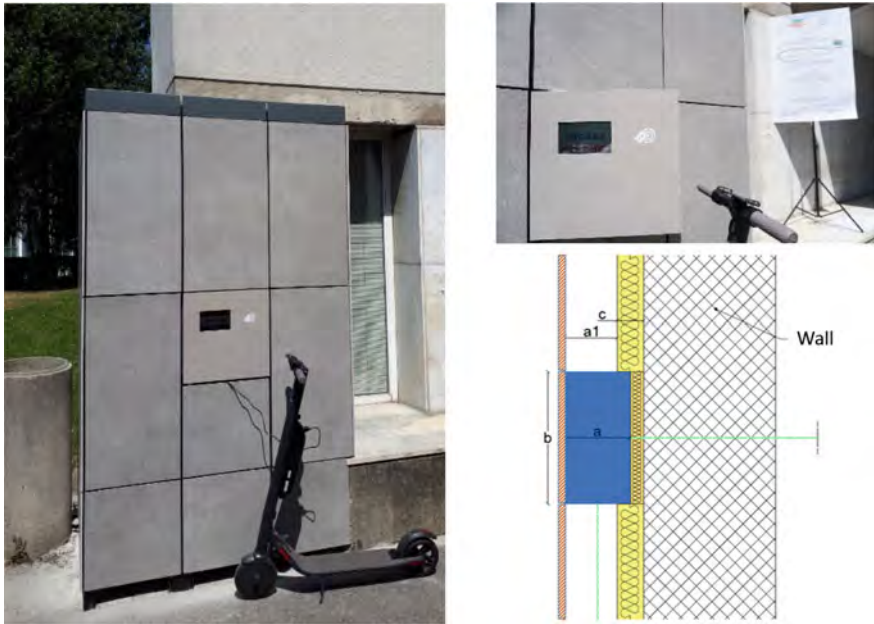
Device completeness perspective, in situ demonstrator view (left and top right) and cross section (bottom right) where a and b are the dimension of the charging box, a1 is the air gap dimension, c the insulation thickness
